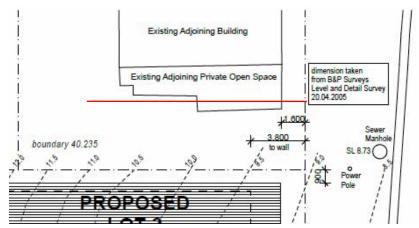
excerpt from Site Plan WD 0.03 Rev C – adjoining existing development at 42 Queen Street
